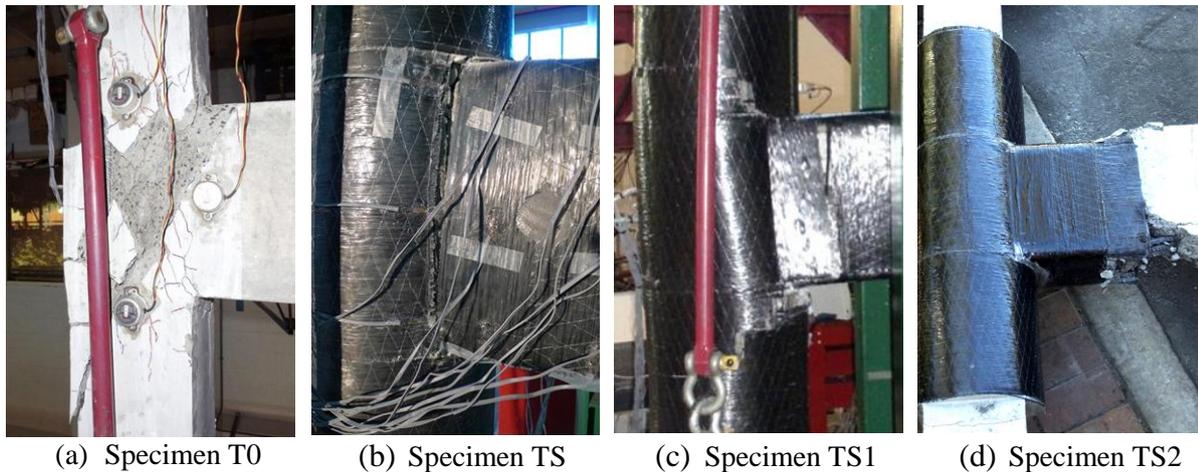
Failures of Specimens T0, TS, TS1 and TS2
